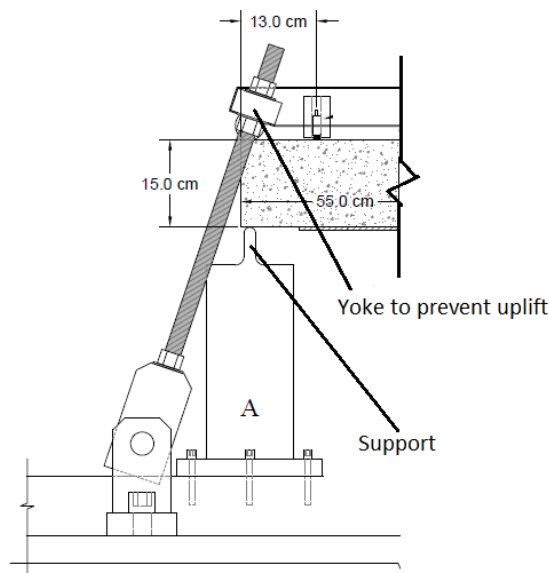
Sketch showing half of the final testing setup used for impact testing (Khalighi, 2009)
